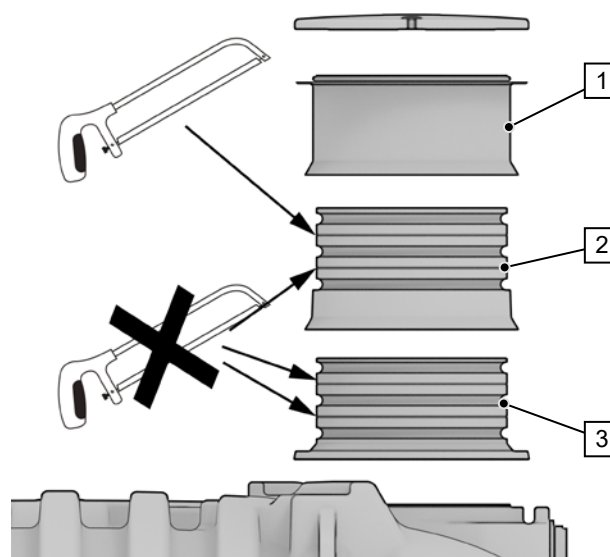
Adjusting the shaft extensions (e.g. primary sedimentation tank shaft)
